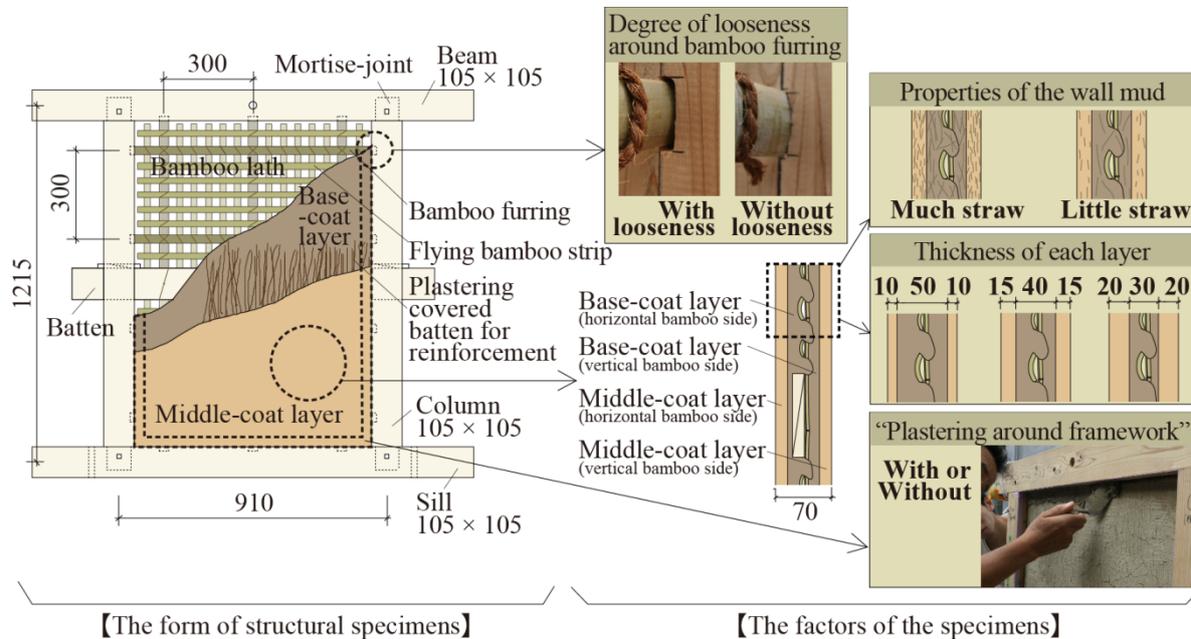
Mud-bamboo wall construction for a real building and for structural specimens.
